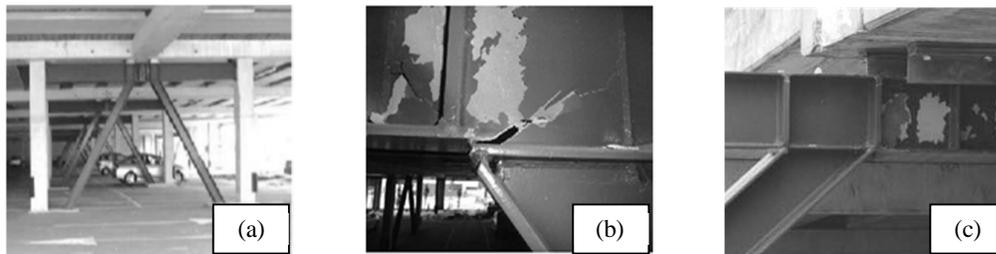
Eccentrically Braced Frames (EBFs) in St. Asaph Street parking structure (a), fracture (b), and shear localization (c)
